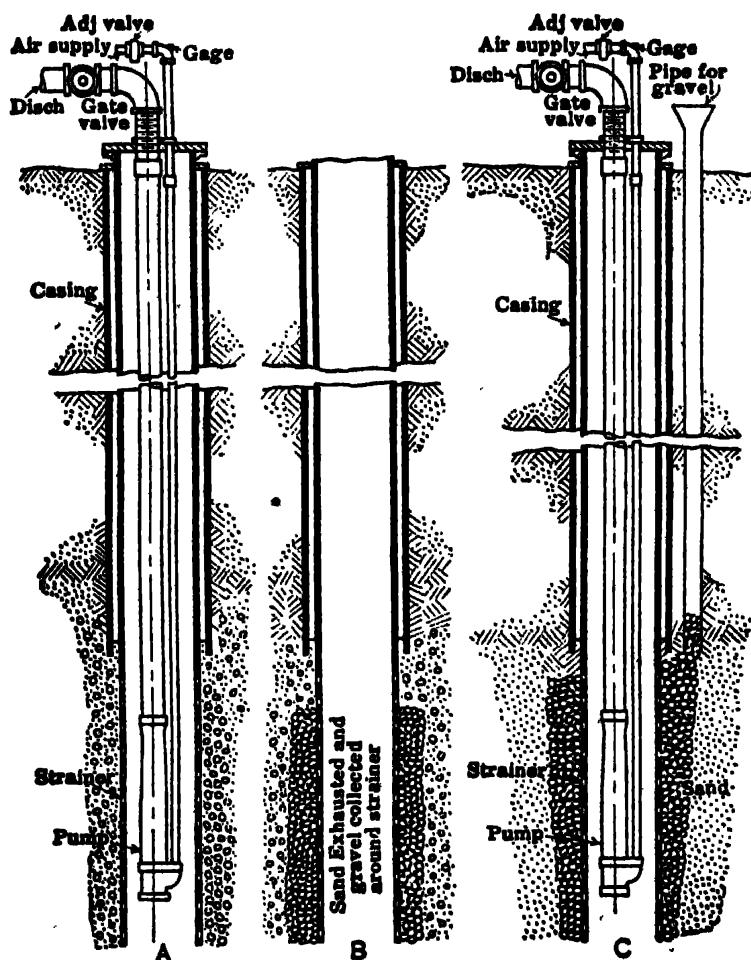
Well Construction under Different Conditions of Water-bearing Sand
